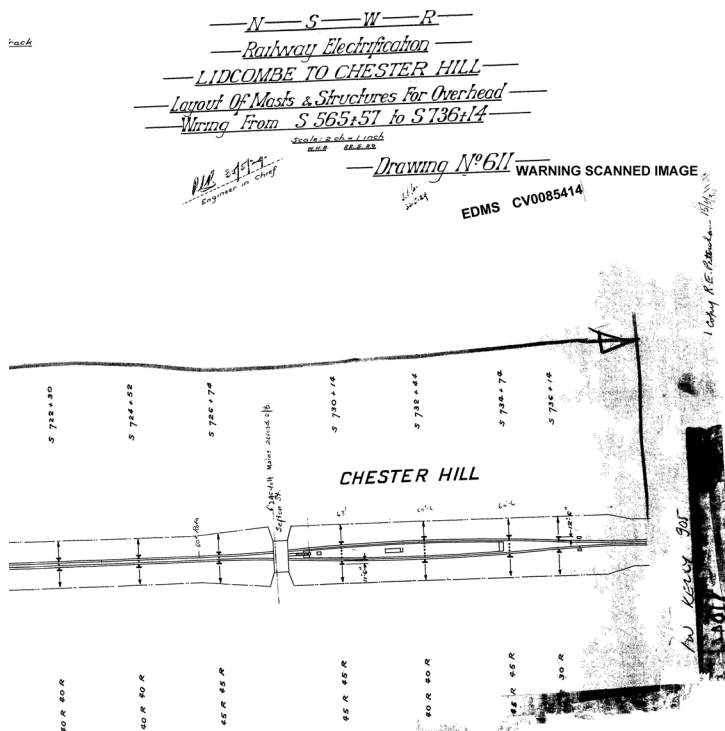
Extract from NSW railway electrification Lidcombe to Chester Hill – layout of masts and structures for overhead wiring, c.1929 (Virtual Plan Room).
